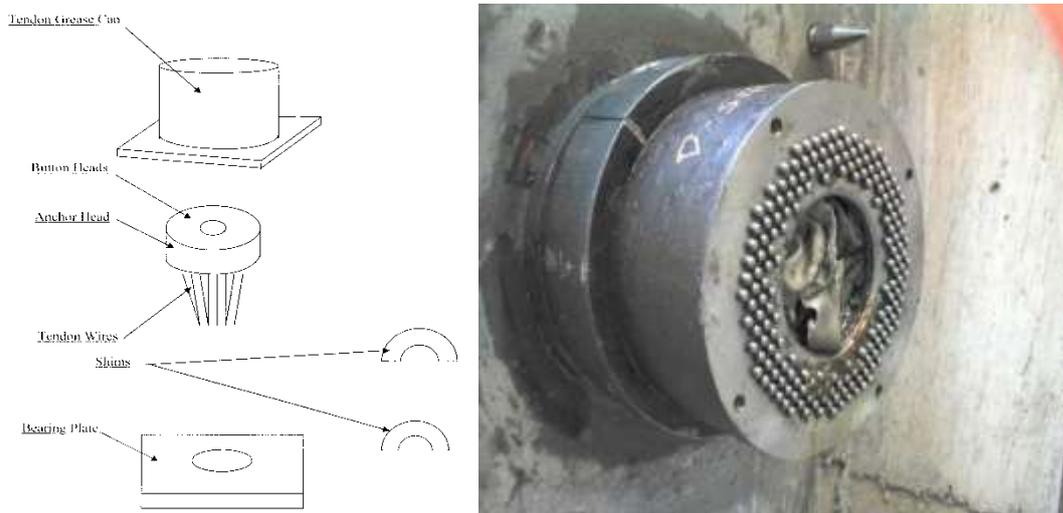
Anchor of VVER1000 type prestressing tendon
